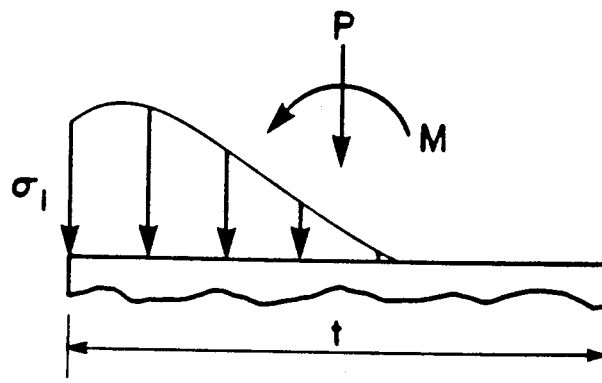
Internal Stress Distribution on a Wall Cross-Section Having a Compression Failure (Ferguson, 1979)
